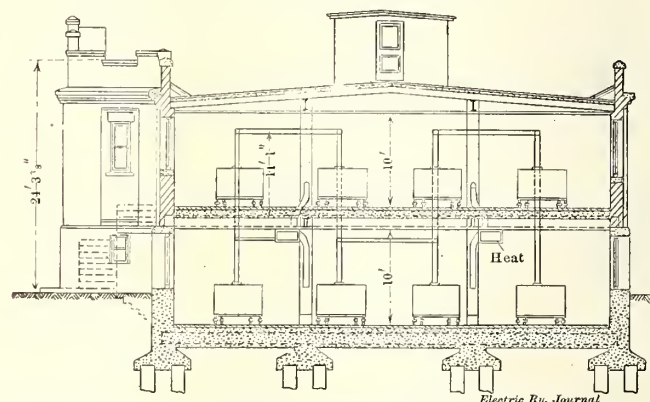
Detroit Tunnel—Cross-Section of Substation Along Line G-G Shown on Plan
